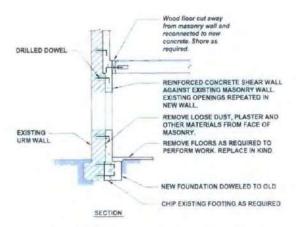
FEMA Typical Detail for Concrete Overlay Walls [5].
